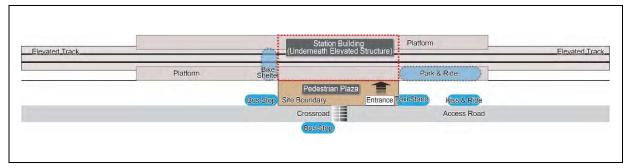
Prototype Site Plan of Elevated Type Small Station
